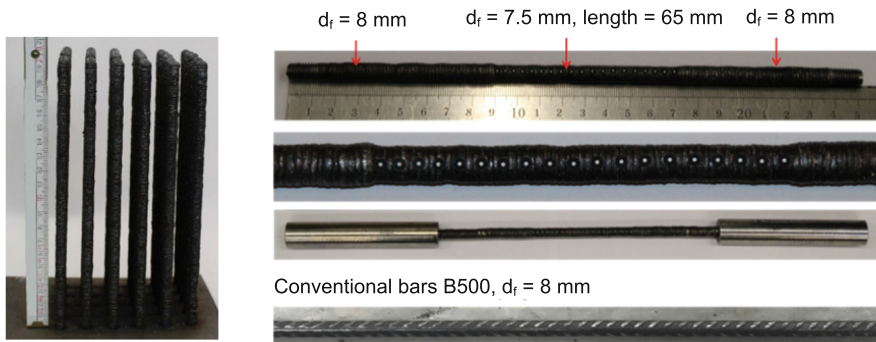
(a) Steel bars produced by 3D printing, (b) Specimens for uniaxial tension tests [8].
